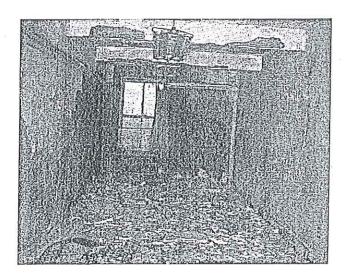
The finishes and concrete slab at the southwest corner of the building are saturated at the upper floors. The areas of saturation are smaller on lower floors, but are generally still present. Continued exposure to water will, ultimately, lead to corrosion of the steel reinforcing in the concrete, corrosion of the steel frame, and a reduction in the capacity of the structure to carry load. Freeze-thaw damage may also occur as the building is unoccupied and unheated
